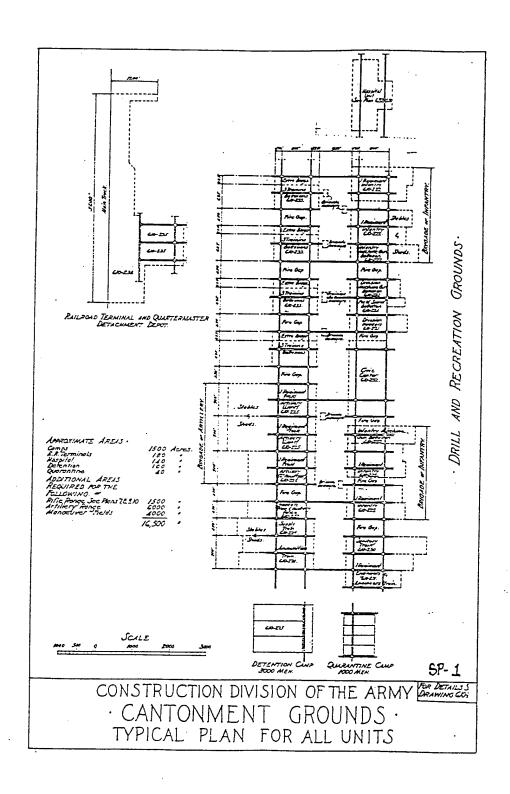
Cantonment Grounds, Typical Plans for All Units. Source: Manual of the Construction Division of the Army, Section C, Engineering Division, 1918.
